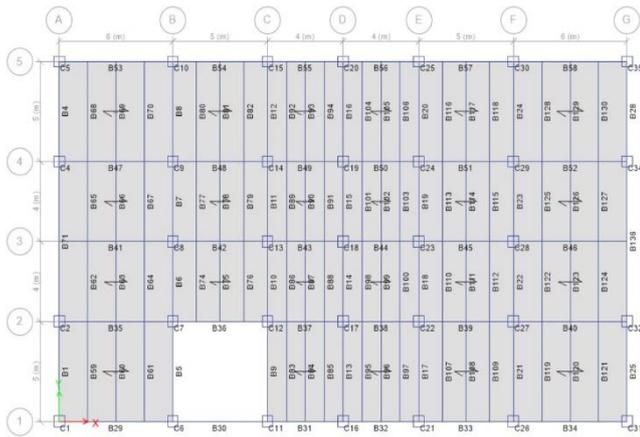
2D Plan View of Steel Model 3 At Storey 2
